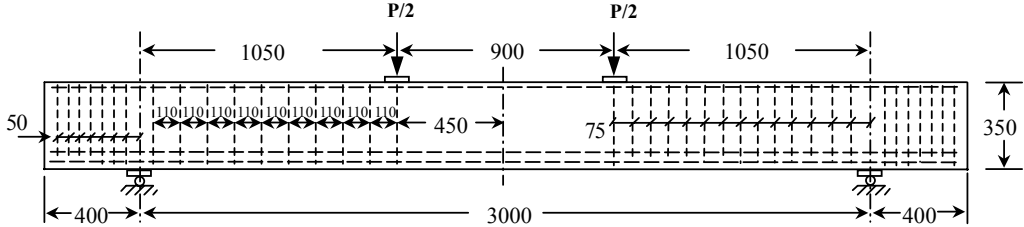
Loading condition and stirrup arrangement (unit: mm)
